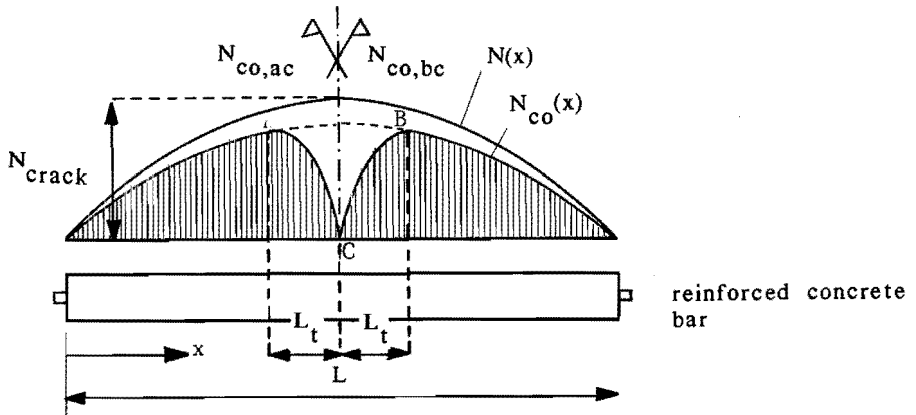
Distribution of the tensile force between concrete and reinforcement just before and after the first crack.
